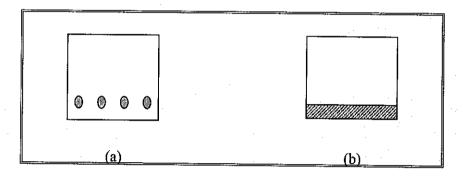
Cross-section of (a) normal reinforced beam and (b) beam with FRP permanent formwork.
